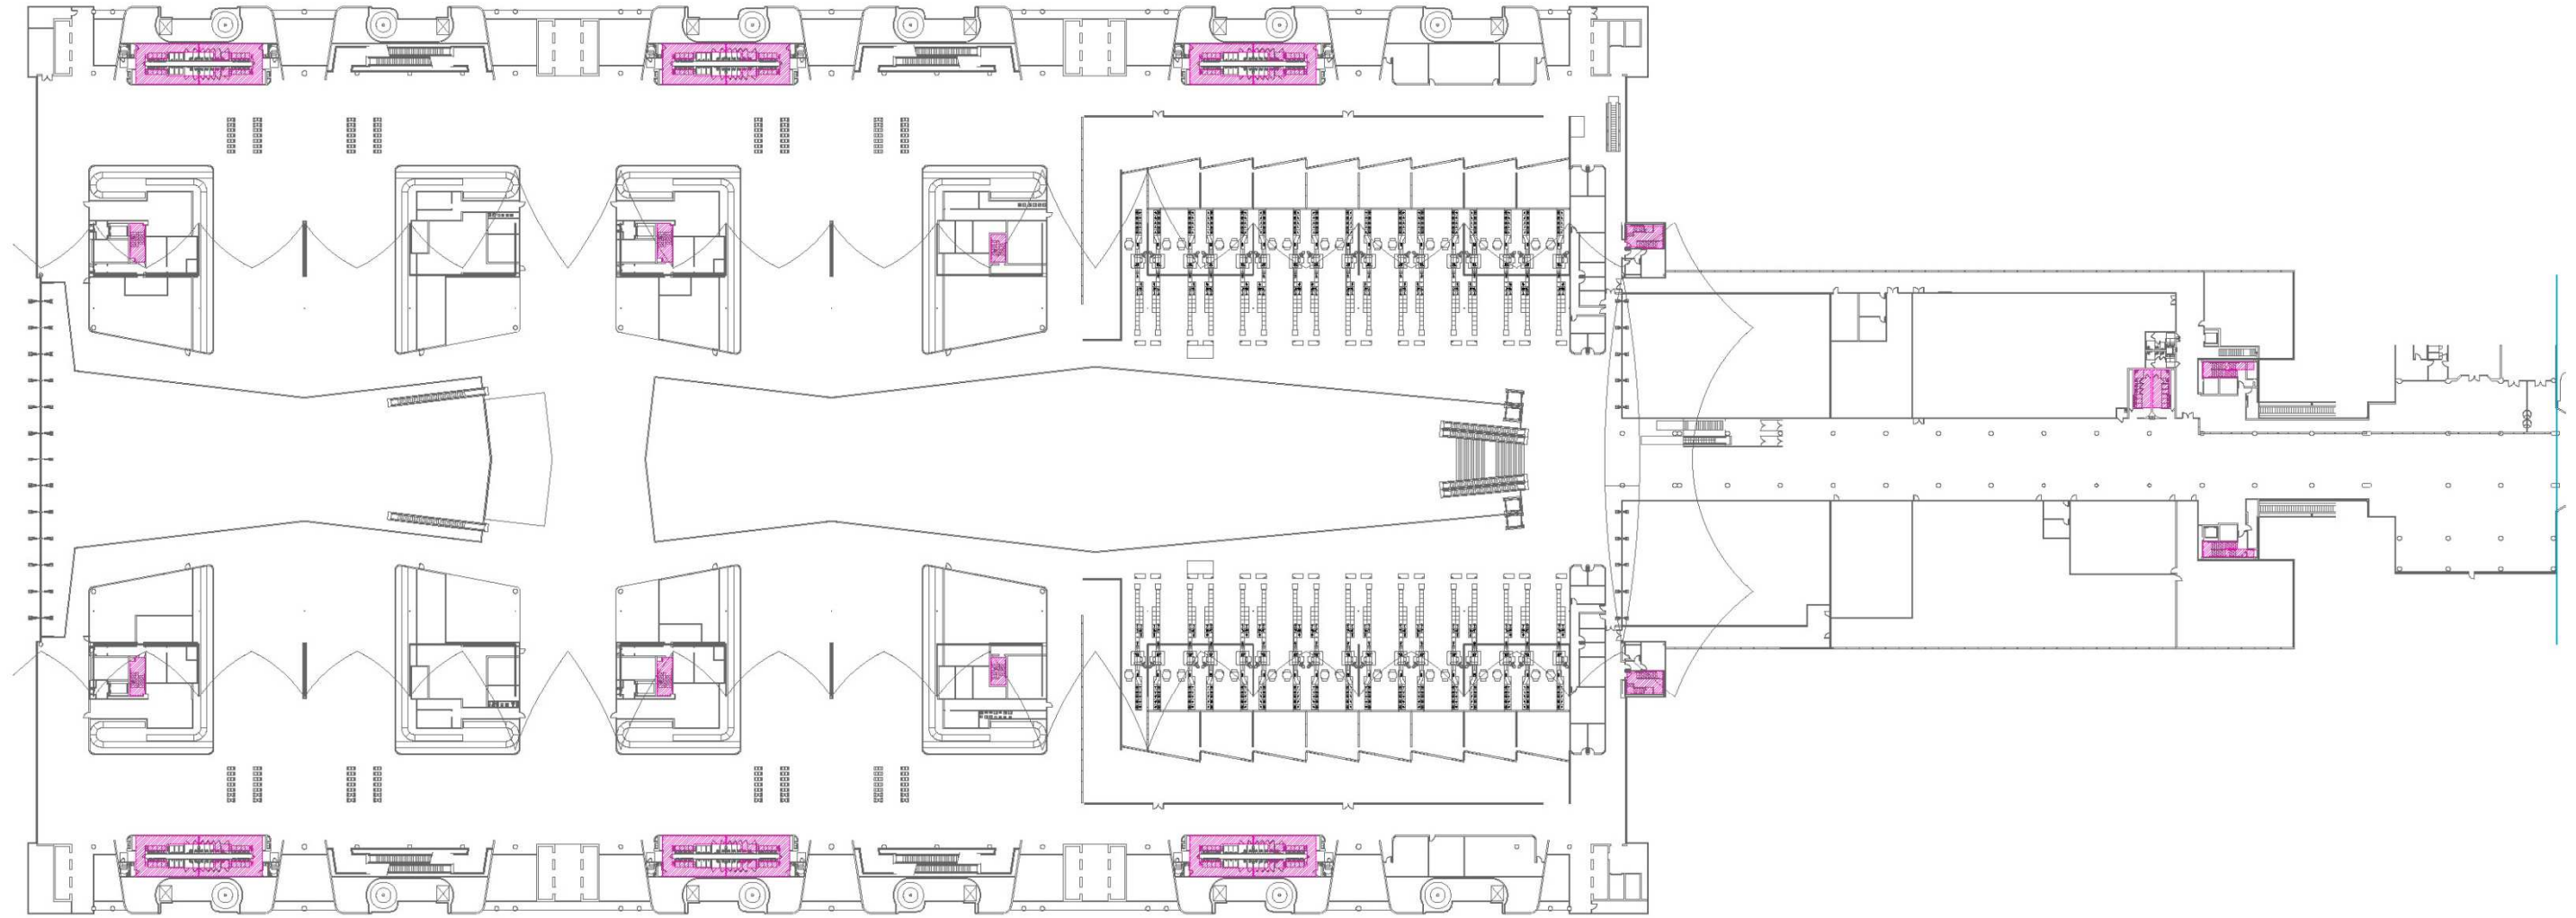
(a) Level 6 Tornado Shelters Diagram
